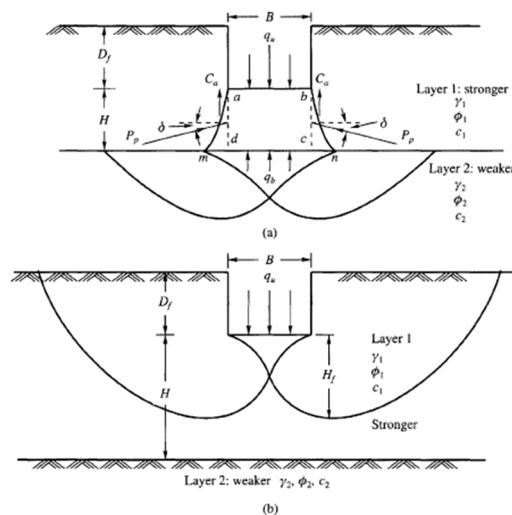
Failure of soil below strip footing under vertical load on strong layer overlying weak deposit (after Meyerhof and Hanna, 1978)
